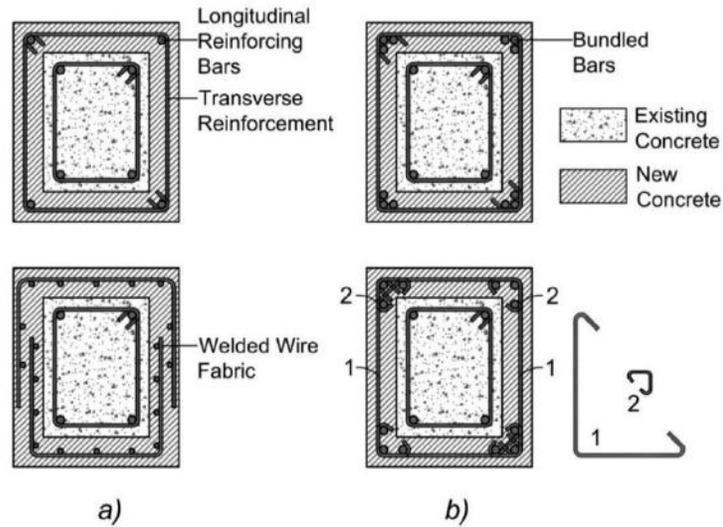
Cross-section and reinforcement for RC column jackets: a) jackets for enhancing axial and shear resistance and b) jackets for enhancing flexural resistance.
